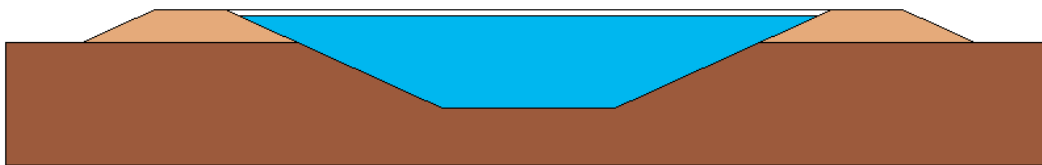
Principle sketch of a pit heat storage cross section (PlanEnergi)
